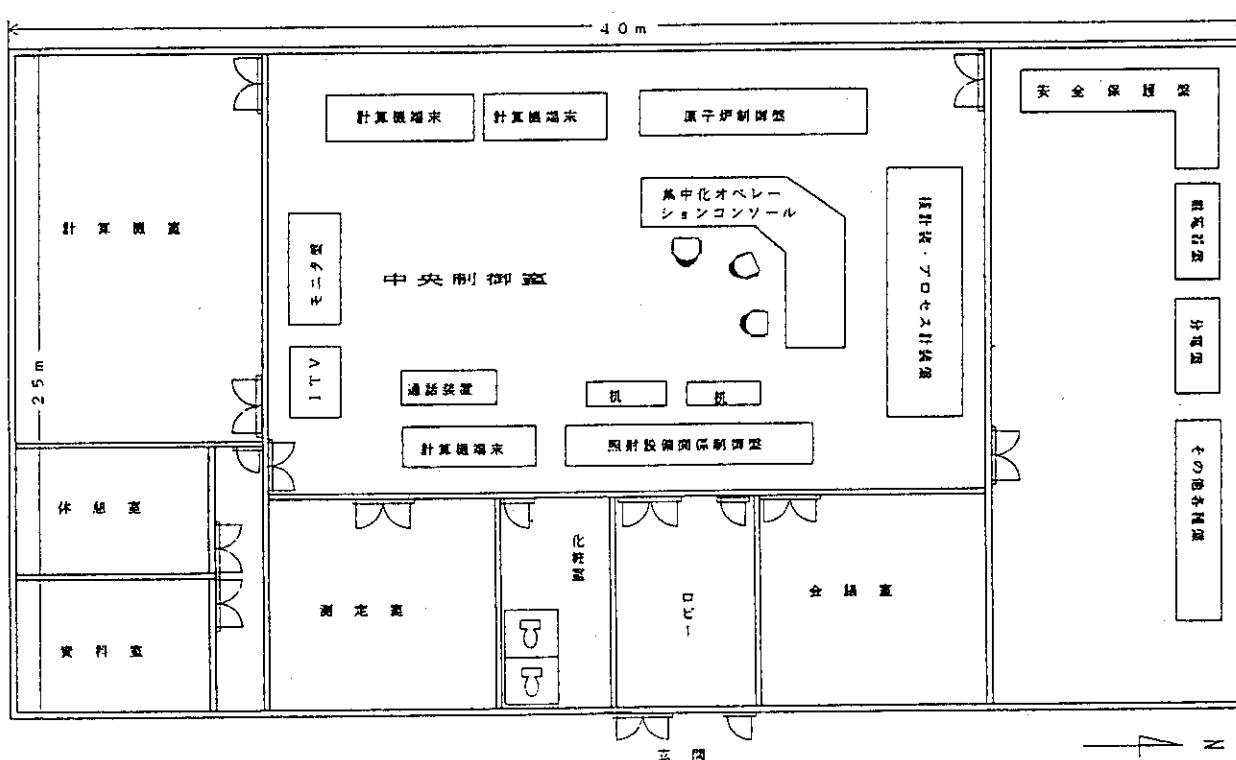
Arrangement of the New Reactor Control Building
